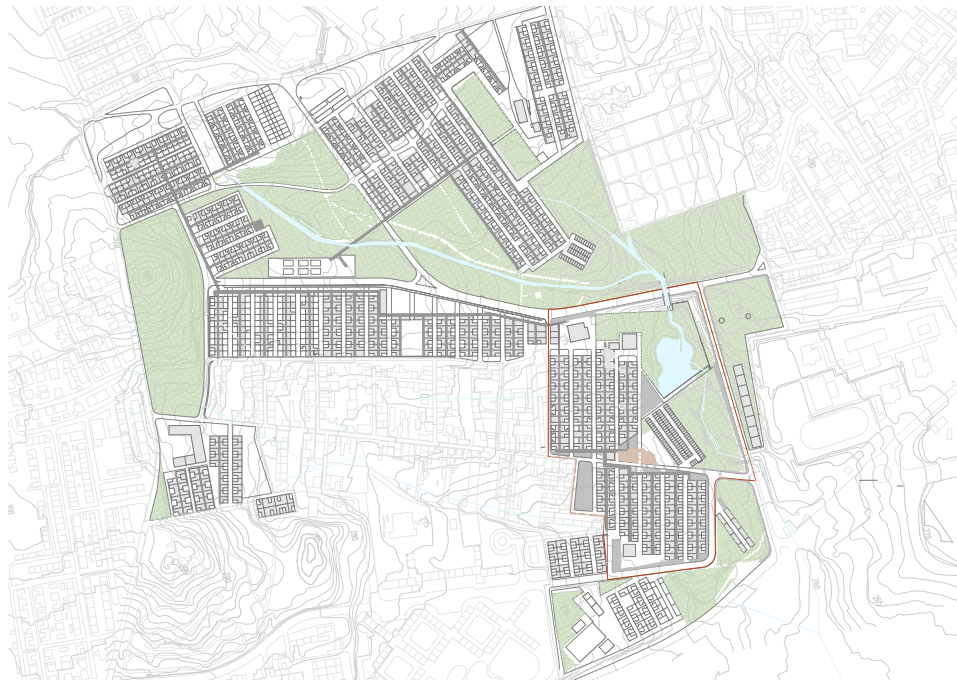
Malagueira's plan with the intervention area in red and the project in brown. By: author.
